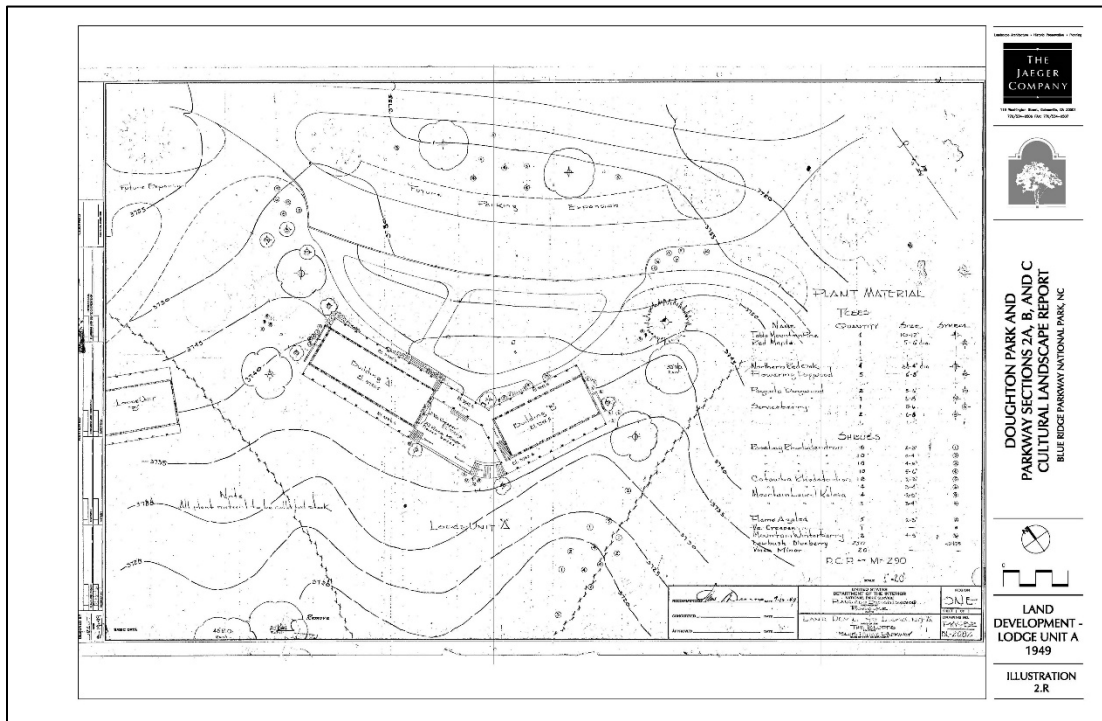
C. 1949 planting plan for Bluffs Lodge. The Jaeger Company, Doughton Park and Sections 2A, B and C Blue Ridge Parkway Cultural Landscape Report (2006), p. 205.
